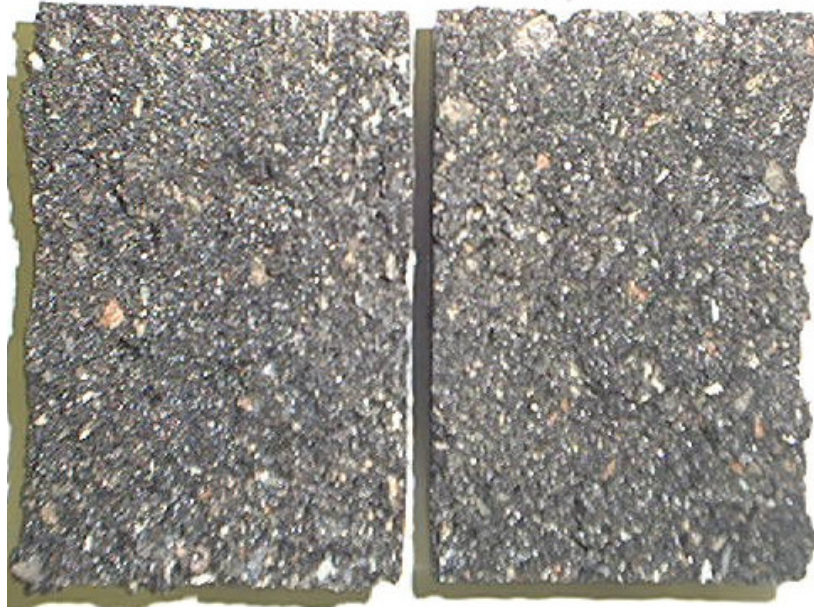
TSR Specimen Failure: 5% Enka BHF, 0% LOF
